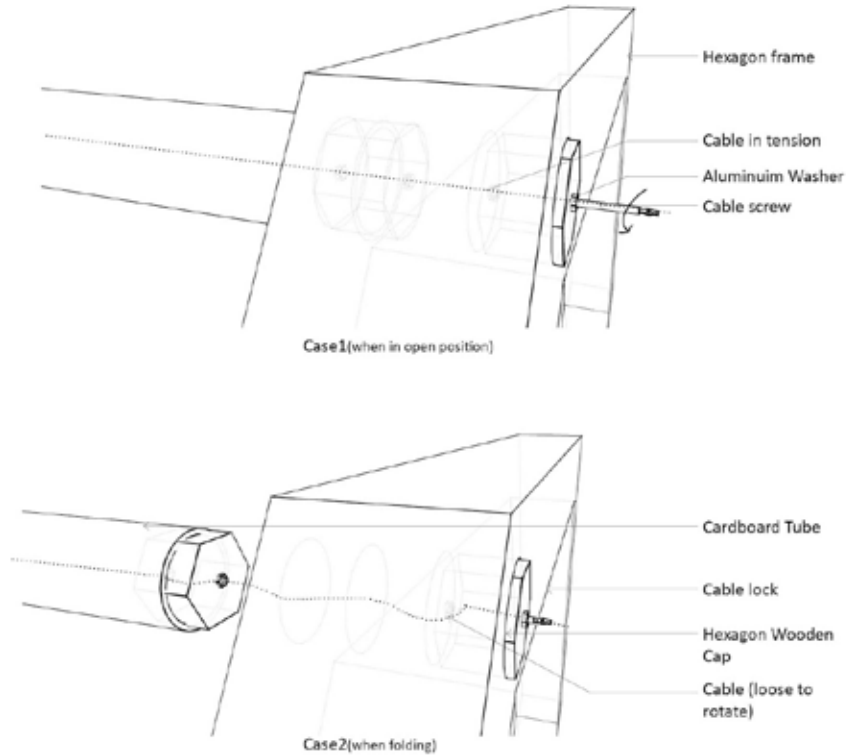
Detail of the connection between the paper tubes and the cardboard frame by means of post-tensioned cables
